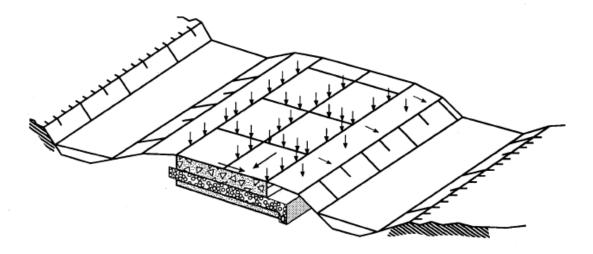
Infiltration of free-water (q<sub>i</sub>) into PCC pavement with many lanes.
